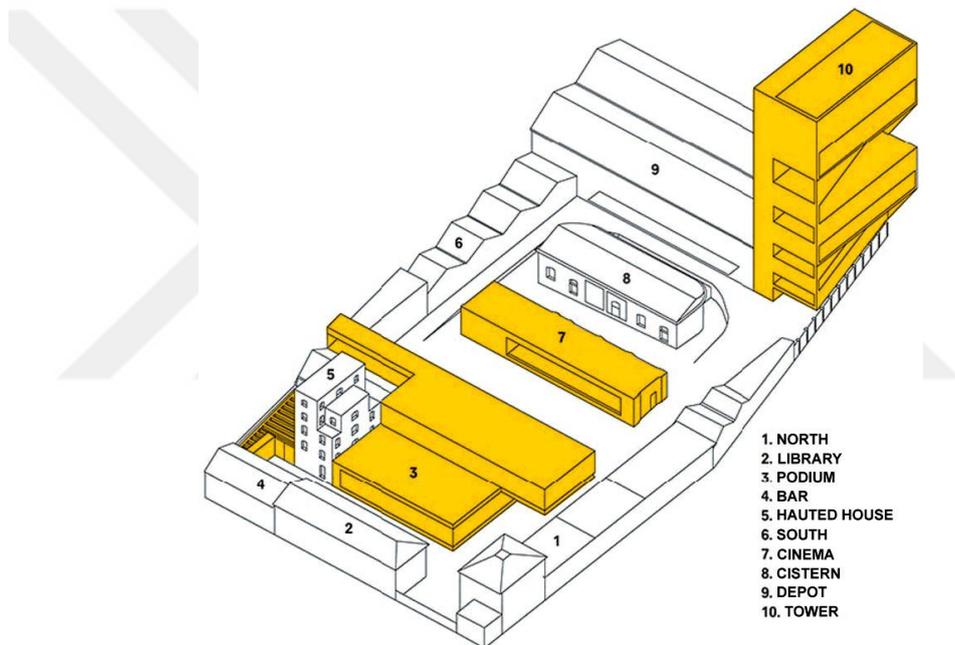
Diagram of the site and program (Source: <http://oma.eu/projects/fondazione-prada>, last accessed on September 12, 2016)
